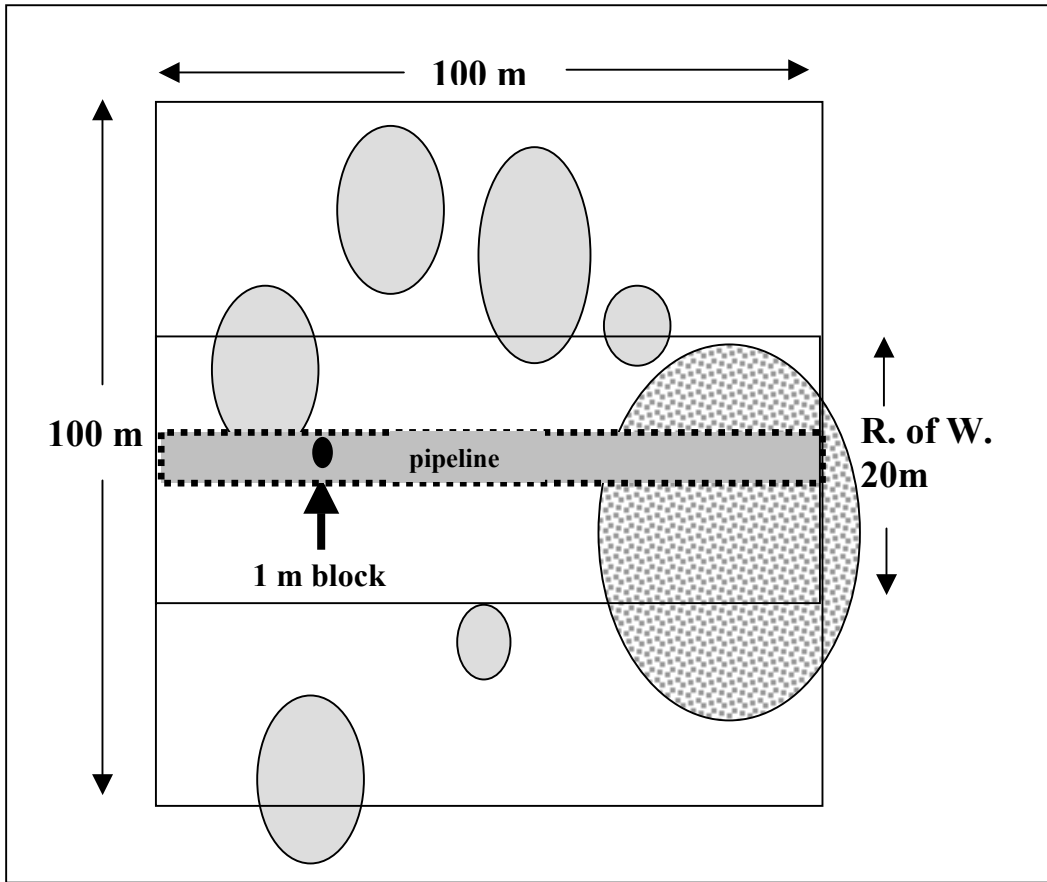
Sketch showing various scales of interest for an area where a 20 m wide road and 2 m wide, 2 m deep pipeline trench will be excavated in a melange bimrock:
